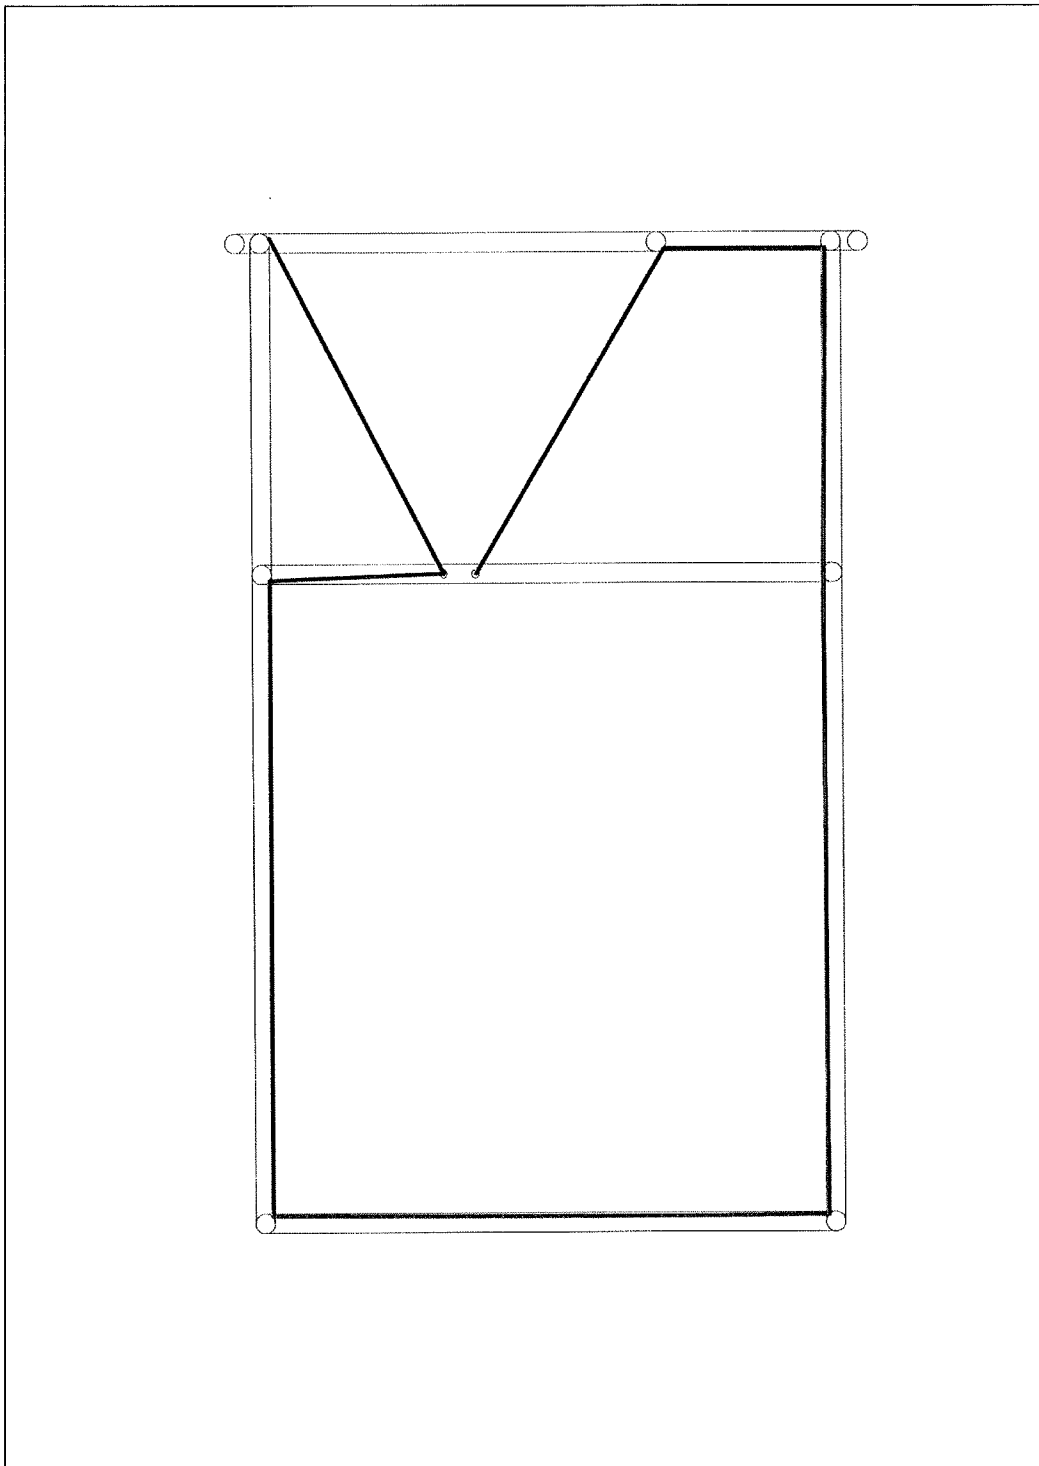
Plan view of Noxontown fish trap used to collect fish at the exit (upper end) of the fish ladder.
